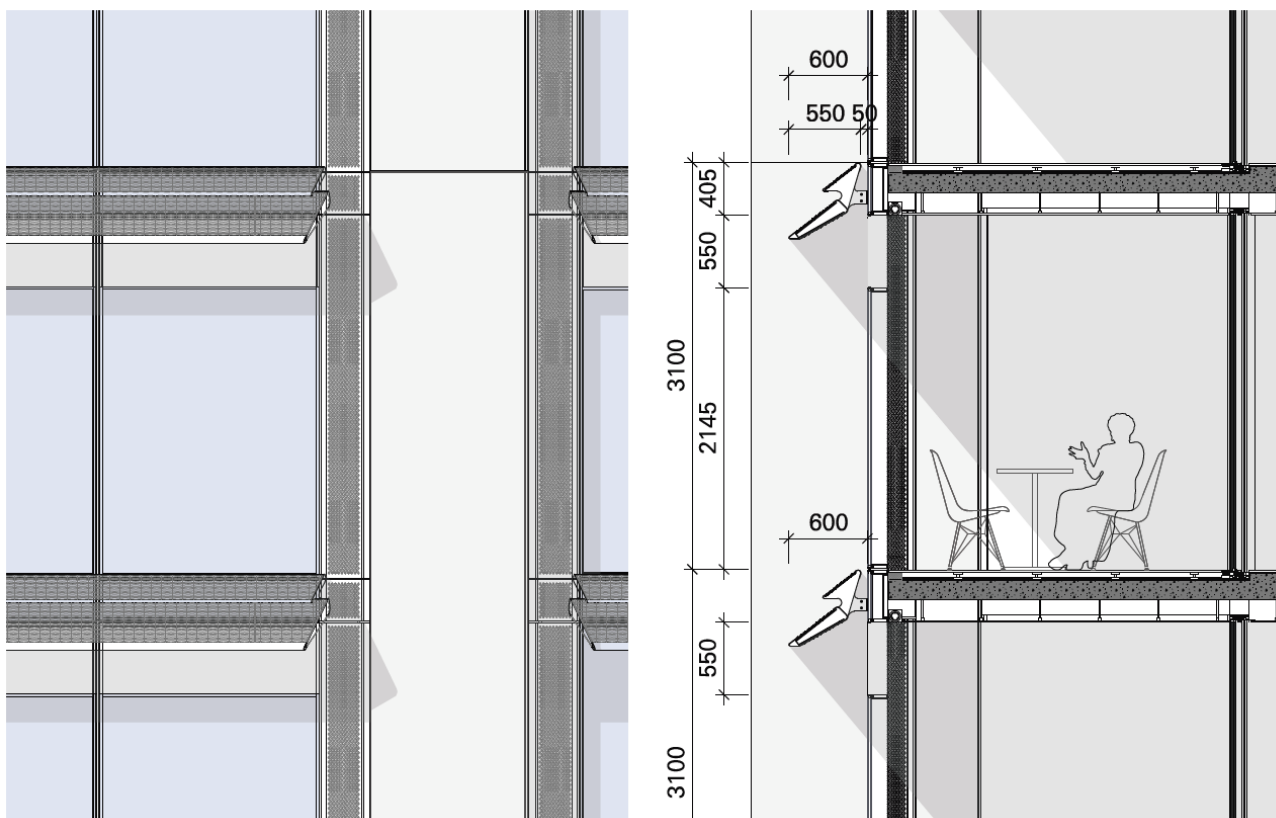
Wind-affected balconies design (left: tower elevation, right: section)
